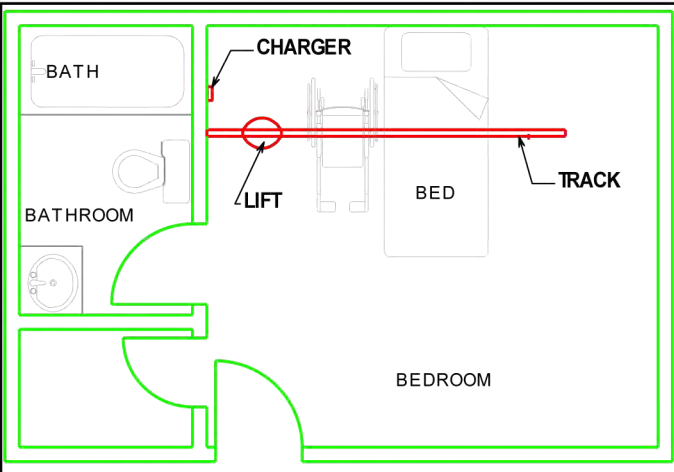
A - Sample floor plan showing basic components of a ceiling lift system.
